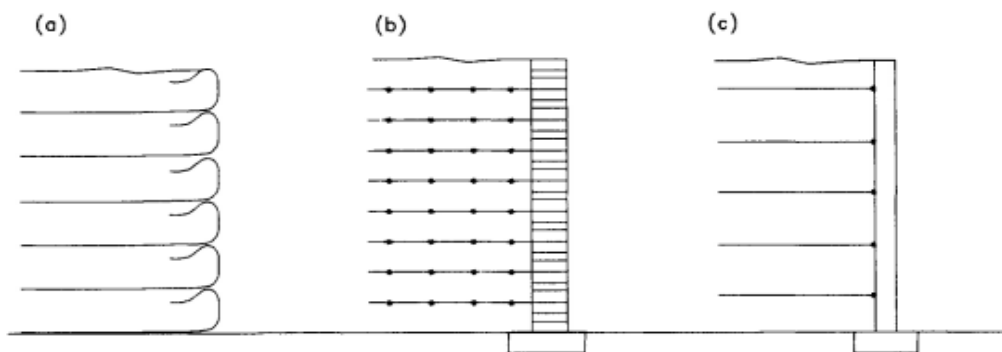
Reinforced retaining (MSE) wall systems using geosynthetics: a) with wrap around geosynthetic facing, b) with segmented precast concrete or timber panel, c) with full height (propped) precast panel [3].
